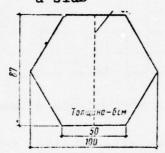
Flat, hexagonal sidewalk pavement, concrete slab
